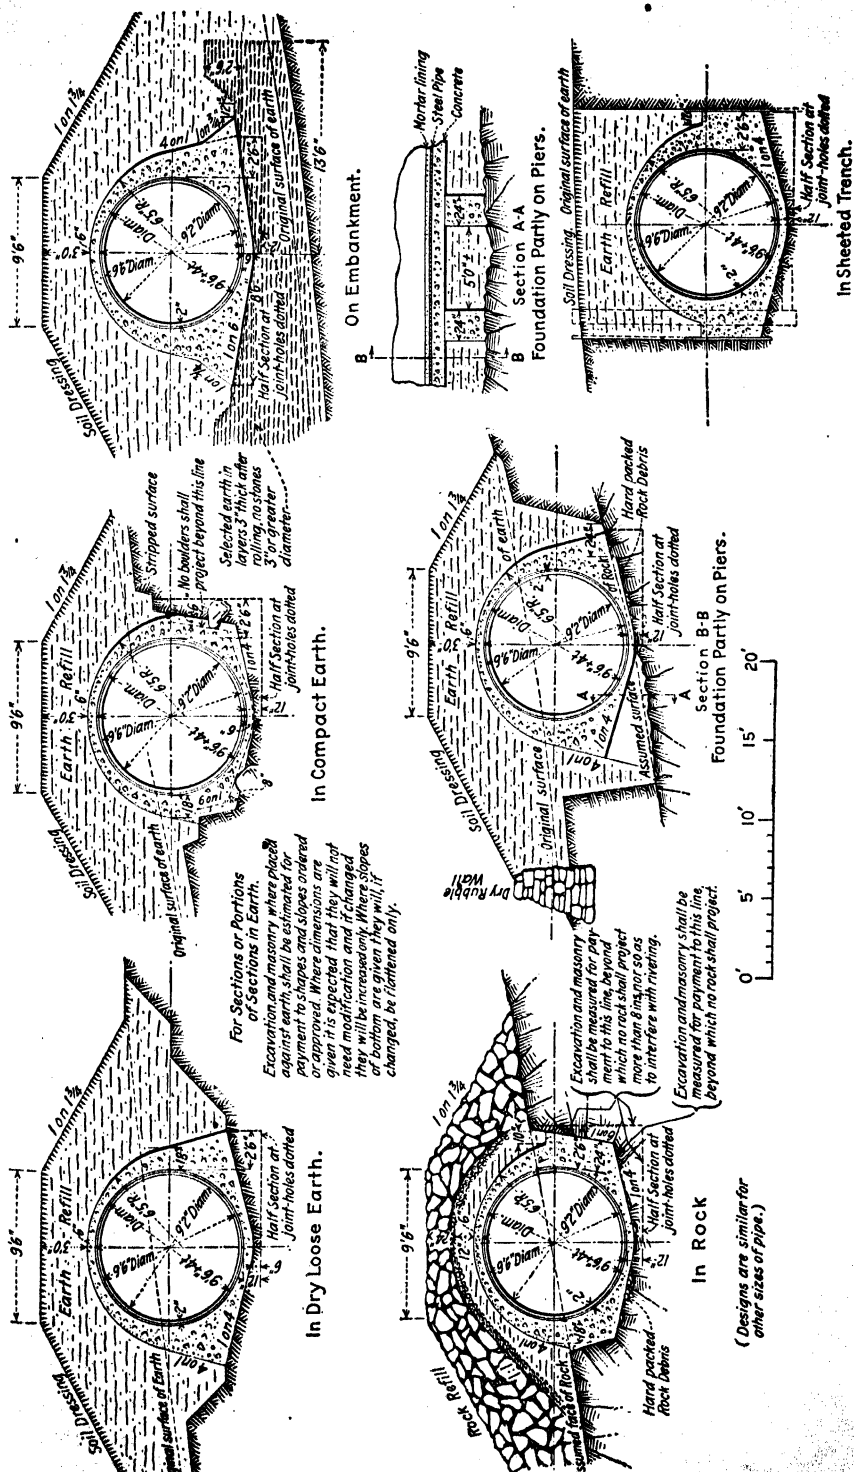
Steel pipe siphons, standard types, Catskill aqueduct.
